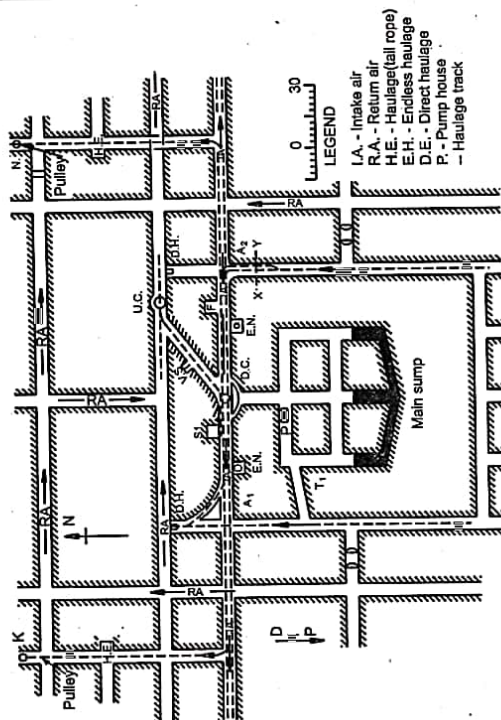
Pit bottom layout. (cage winding). KLMN is shaft pillar.
